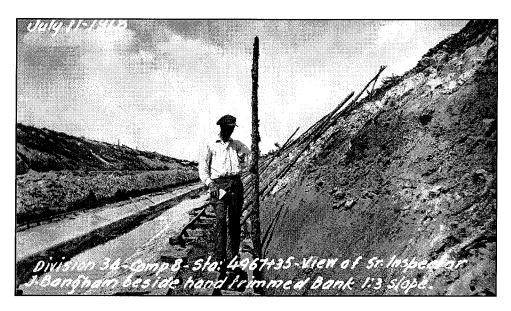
Steep trench side slopes (3V:1H) were excavated where possible. Side slopes were flattened to 1V:1H when loose or soft soils were encountered.
